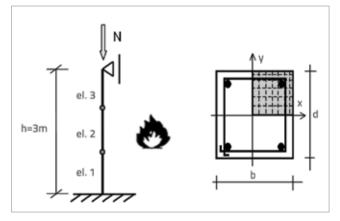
Reinforced-concrete column exposed to standard fire from all four sides
